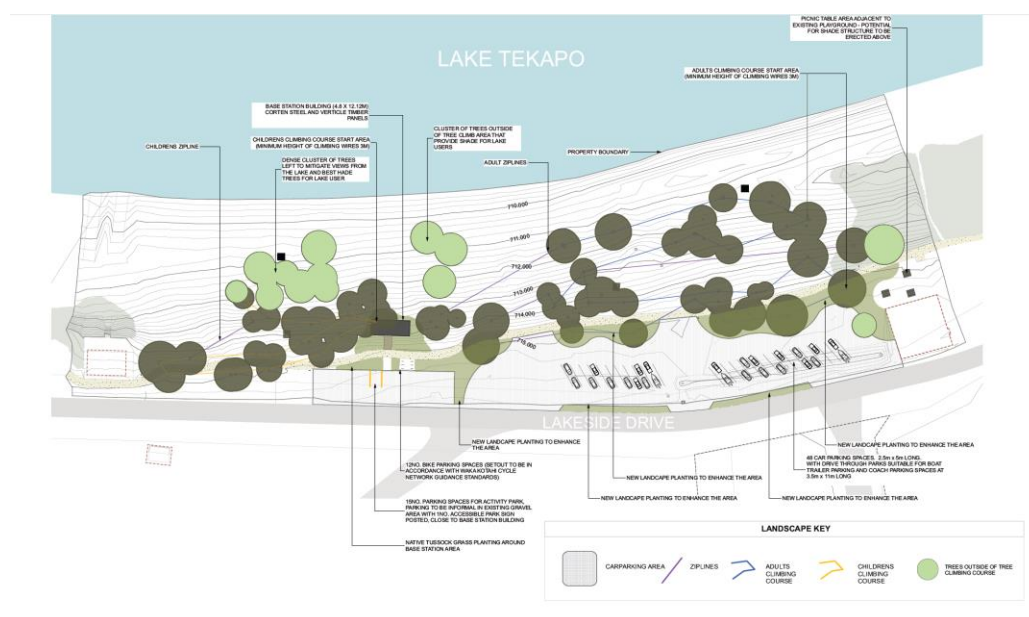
Optional Council Development Landscape Plan (Source: Applicant 4 September 2024)
